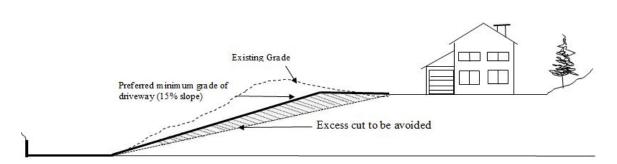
Conforms: When developing on steep slopes, design access roads and driveways that are closest to grade and meet minimum standards for fire safety.
